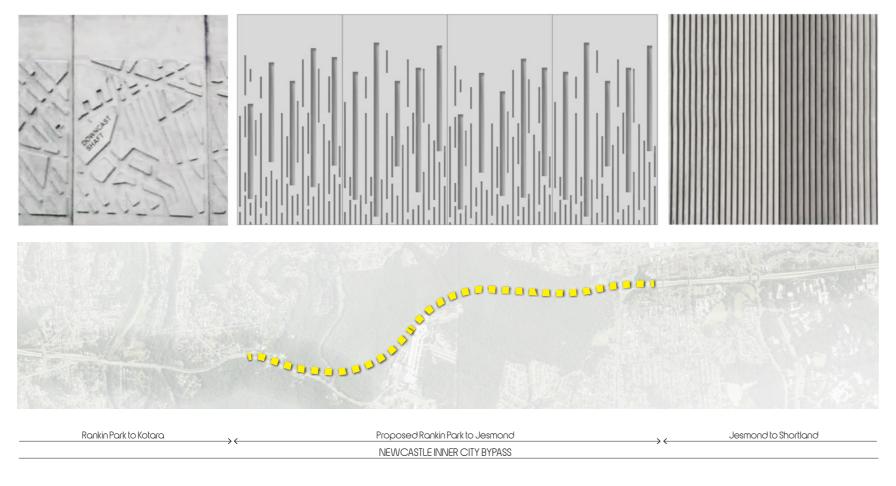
The above figure illustrates the pattern of the adjacent sections of the bypass and the proposed pattern of retaining walls for the Rankin Park to Jesmond section. The pattern attempts to create a transition between the two already built sections whilst presenting its own thematic.
